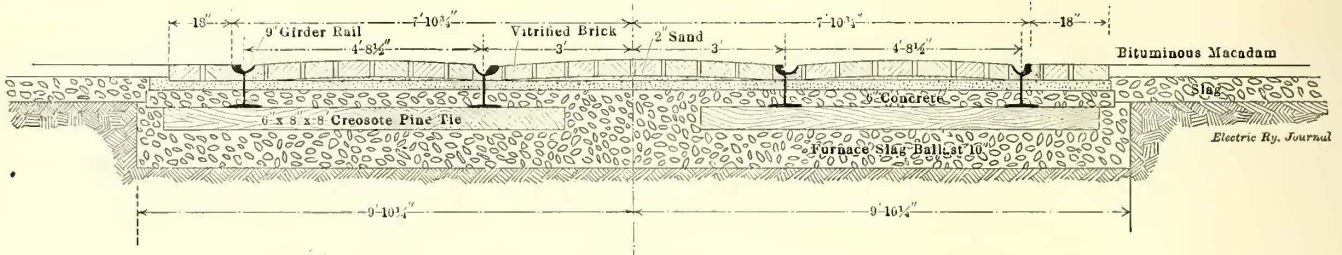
Slag Ballast Construction for Paved Streets in Birmingham, Alabama
